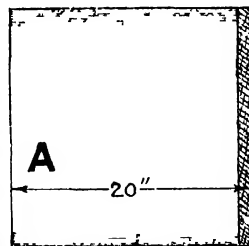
370.—Plan of fancy hard wood floor *One view required
